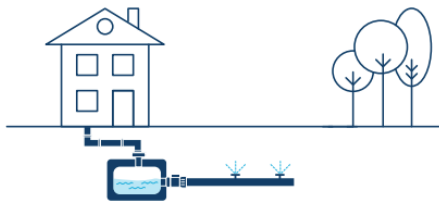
Single house with OWMS. Typically $\leq 5,000$ L/day. Requires a council A20 permit when constructing, installing or altering a system.
